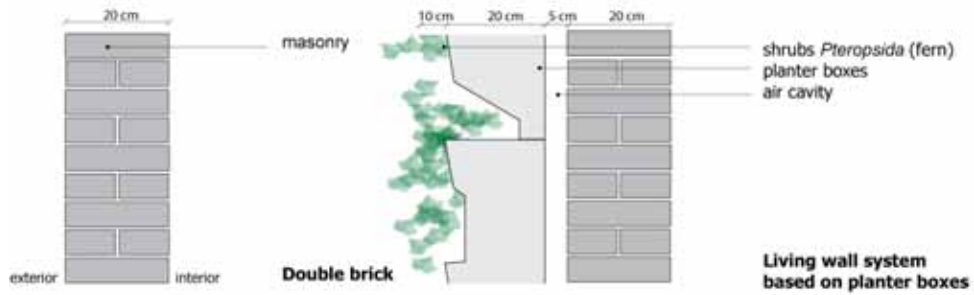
Double brick wall retrofitted with a living wall system based on planter boxes filled with soil.
